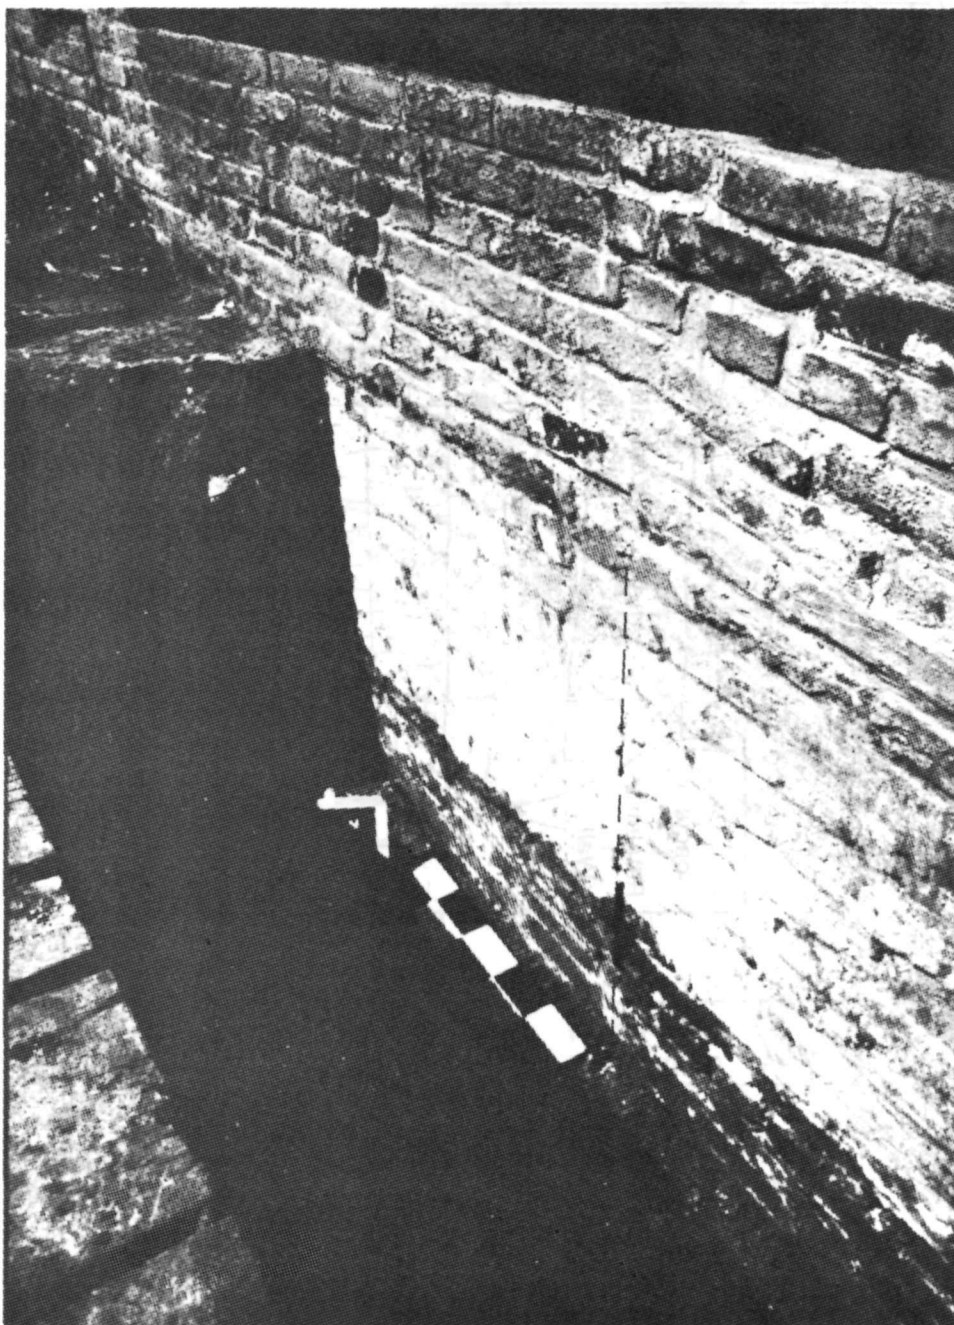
Lincoln Site, Test 8, Photograph of Foundation Wall Illustrating Circa 1848-53 Wall Butted onto Original Corner of Kitchen Wing Foundation.
